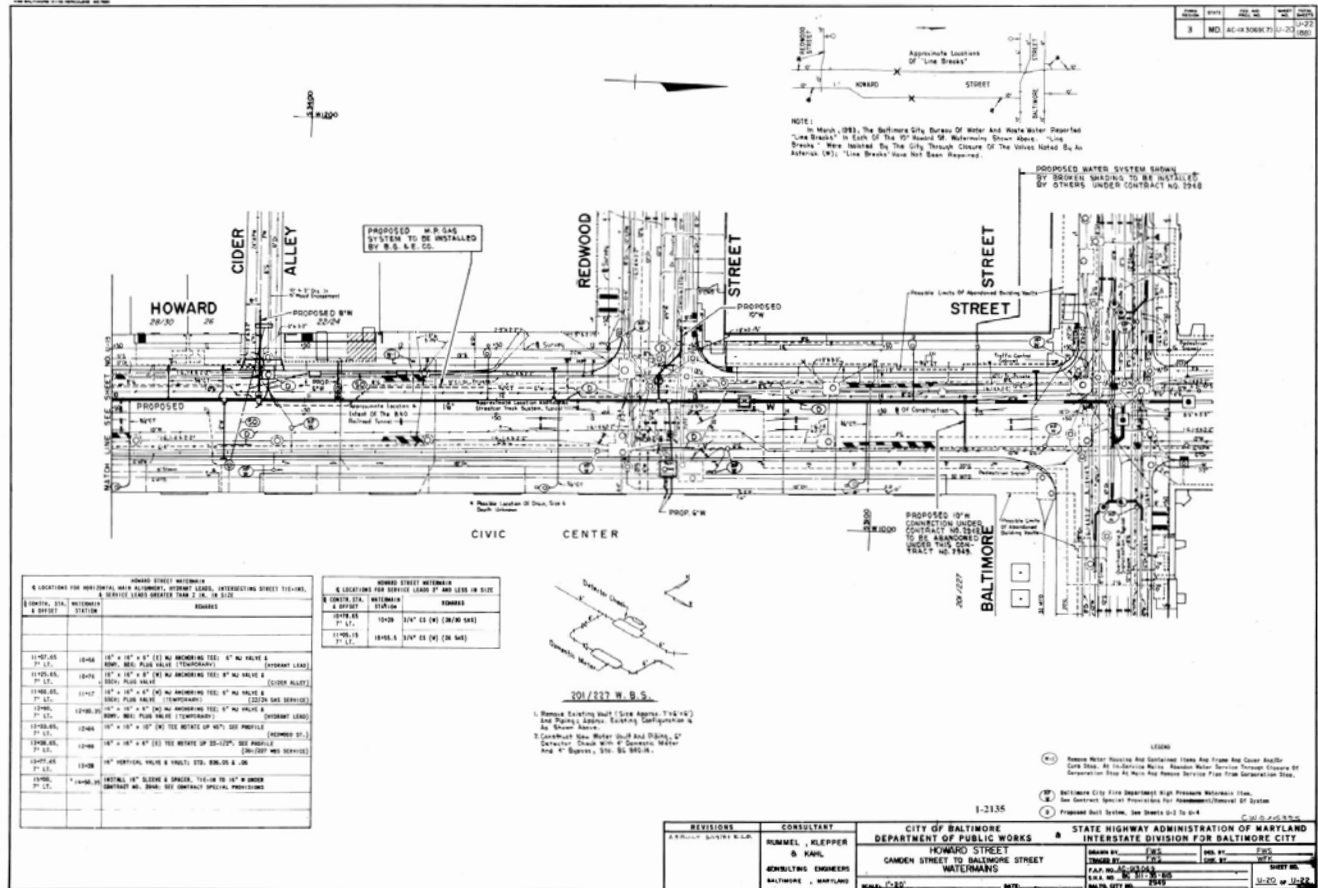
As-built plan view of leak area under Howard Street showing congestion of utilities
